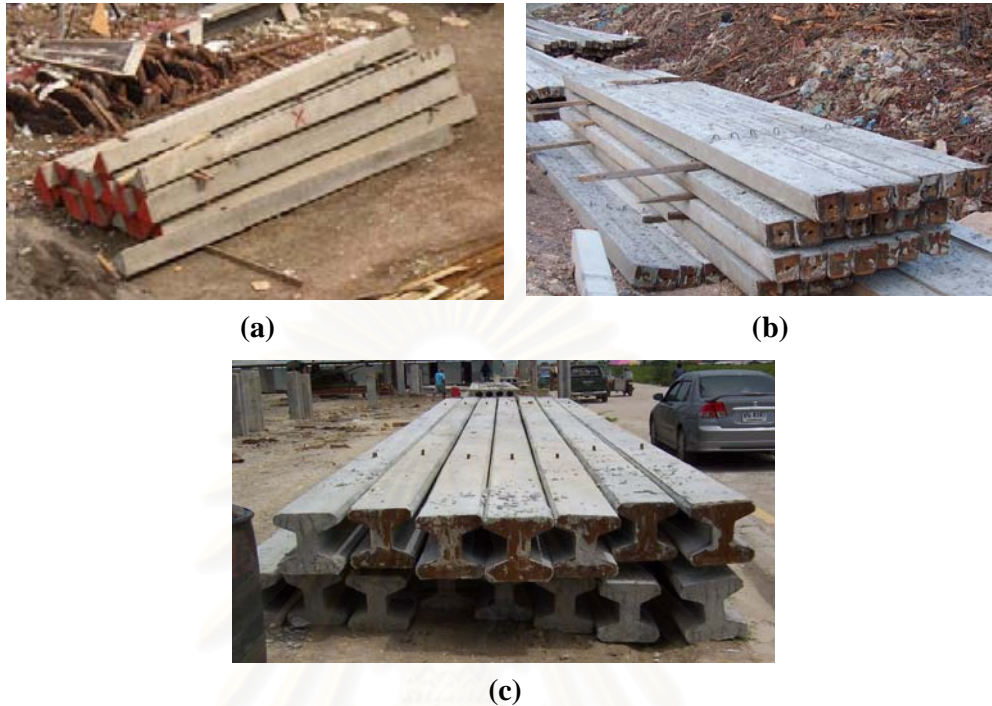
Protection component of (a) Indonesian, (b) Malaysian, and (c) Thai precast piles
